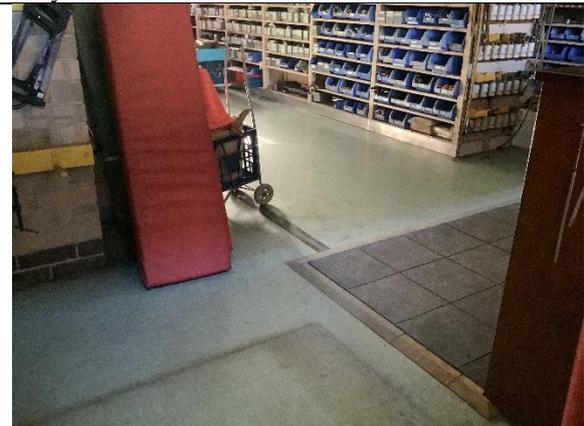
Building G – G.G.34 – Throughout – Floor Covering – Vinyl Tiles - Green
